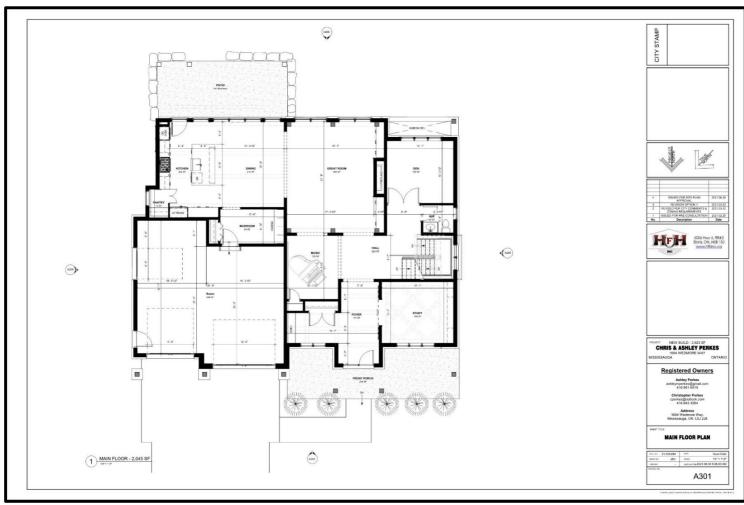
Proposed Development – Main Floor Plan (H4H Inc. 2021)
